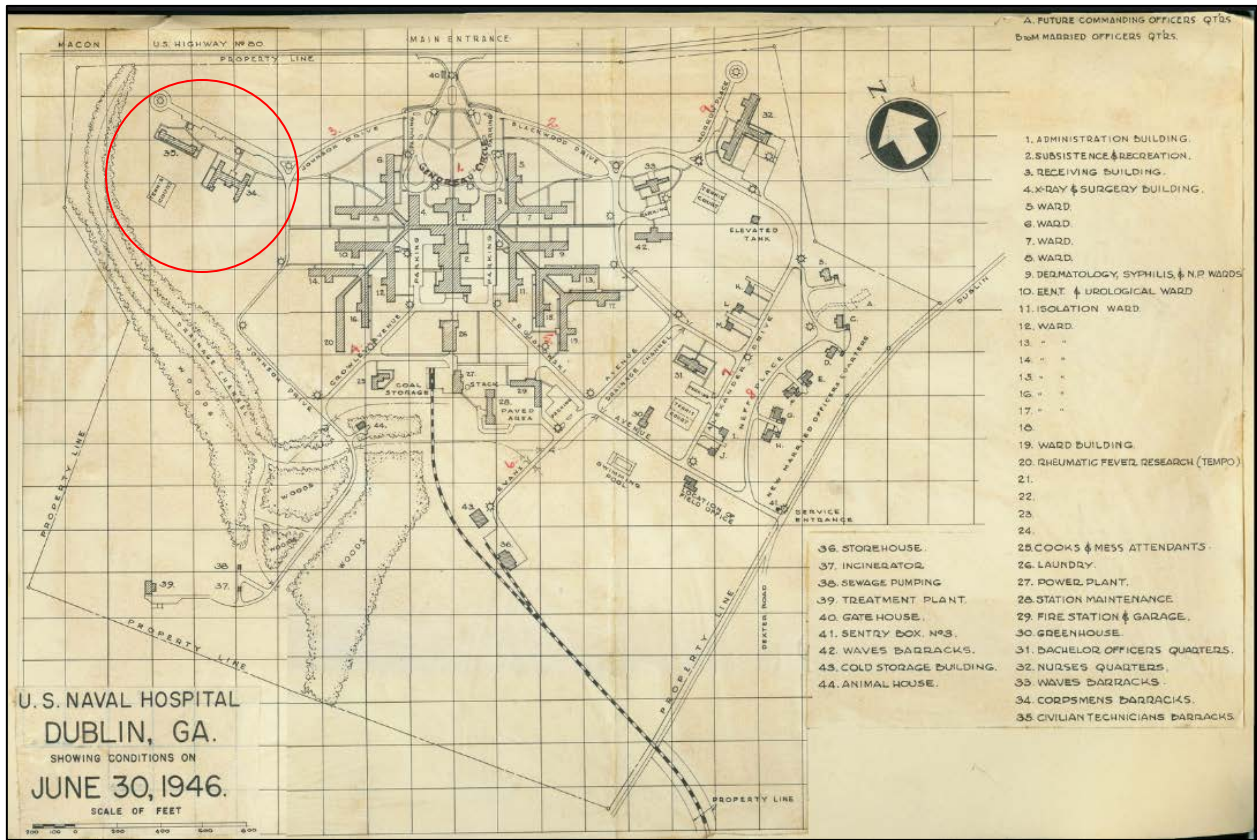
Site plan, 1946 (VA). Note the location of Building Nos. 34 and 35, highlighted in red.
